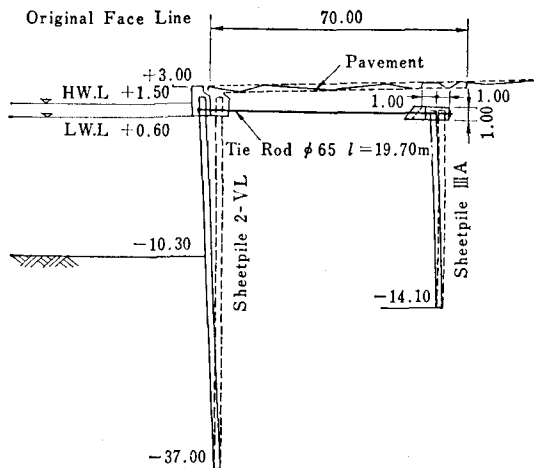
Cross Section of Sheetpile Bulkhead in Nakajima Pier in Ishinomaki Port
